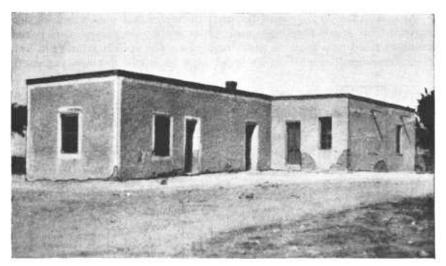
Better type of house built by Mexicans. Lack of masonry foundation and protection at the ground caused the lime stucco to fail. This defect should be remedied as suggested in figure 10. The decorative coping of burnt brick, the short chimney carried by the wall, and the roof outlets are features of interest. This house is more than 50 years old.
